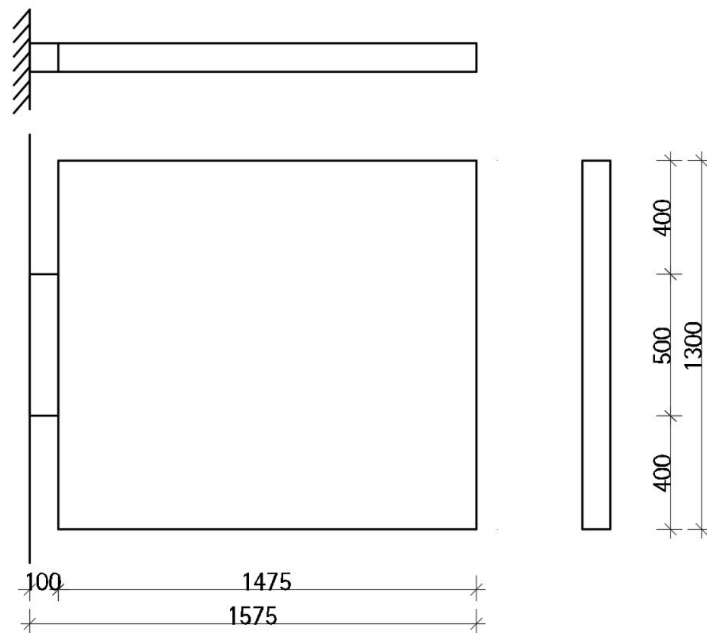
Schematic drawing of cantilever balcony with ridge connection.
